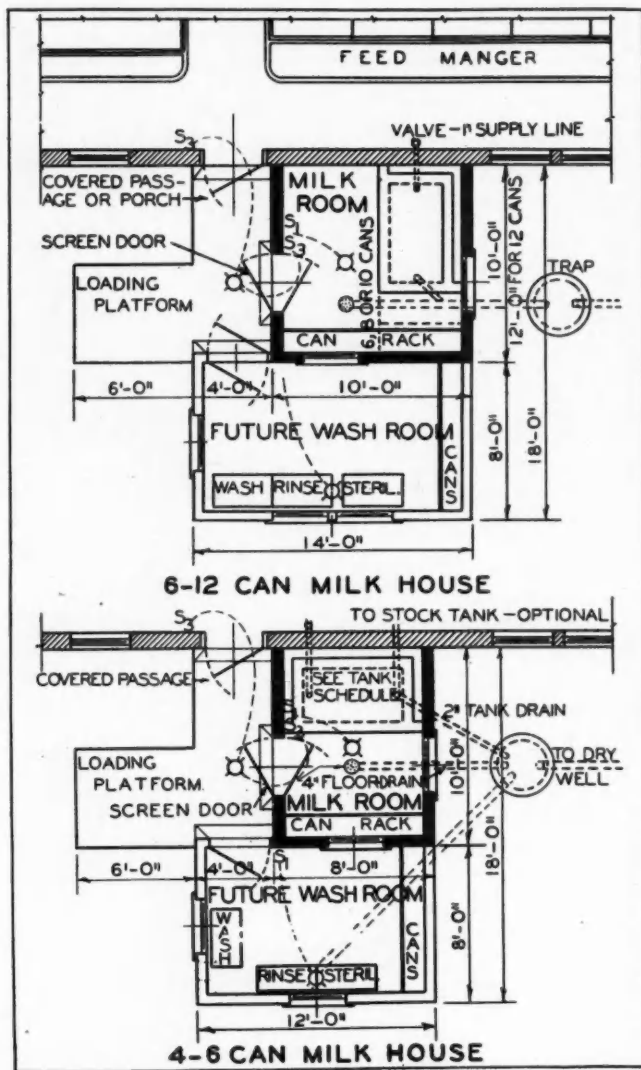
At left, plans for two single-room minimum milk houses showing possible future additions; the upper plan is of a 6-12 can capacity, the lower one for 4-6 can size. FIG. 4—Above are cross section and elevation details for the milk house in Fig. 3.
